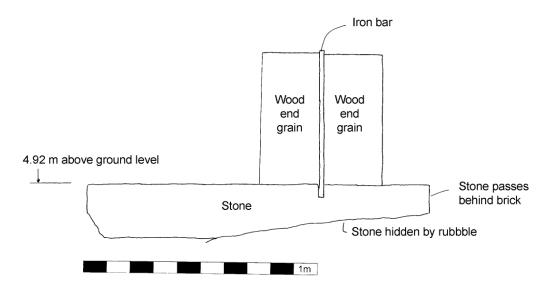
Cut AE – two timbers and a stone block embedded in the wall.
